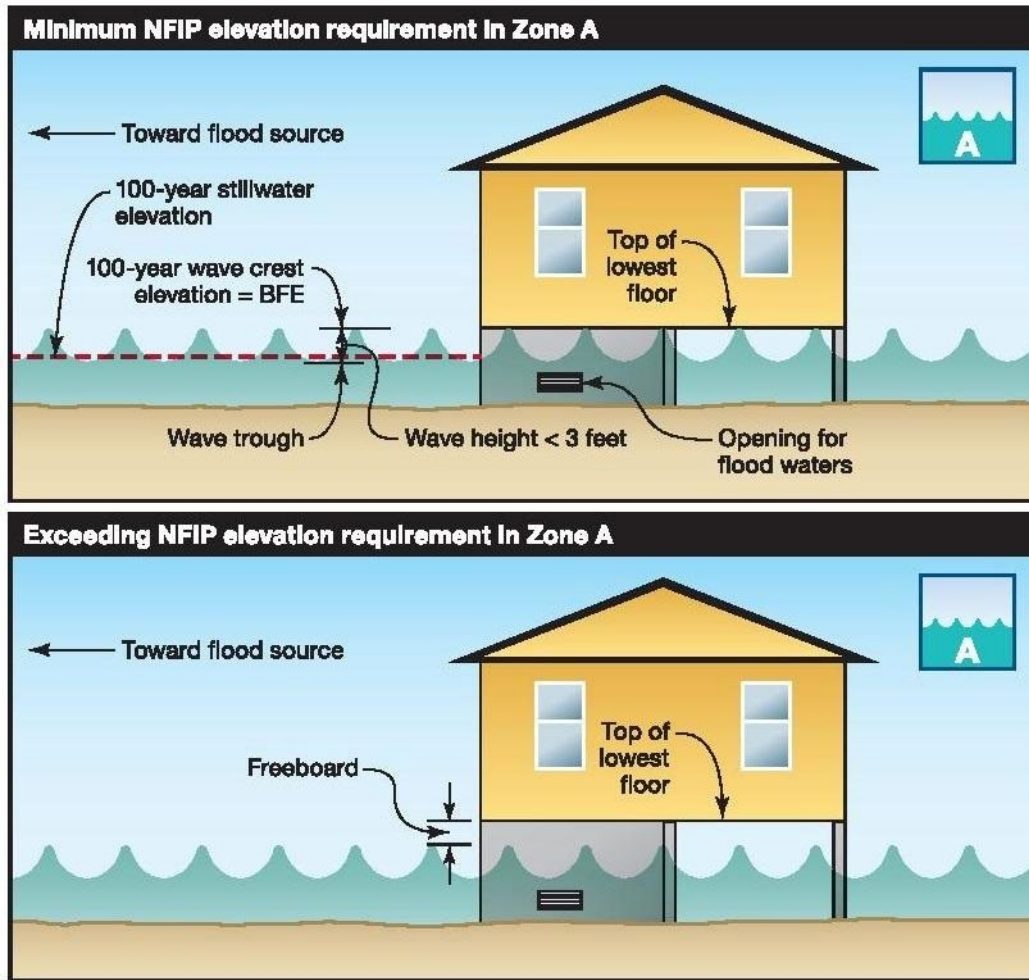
Recommended Elevation for Buildings in Zone A Compared to Minimum Requirements Source: FEMA Coastal Construction Manual, 2011
